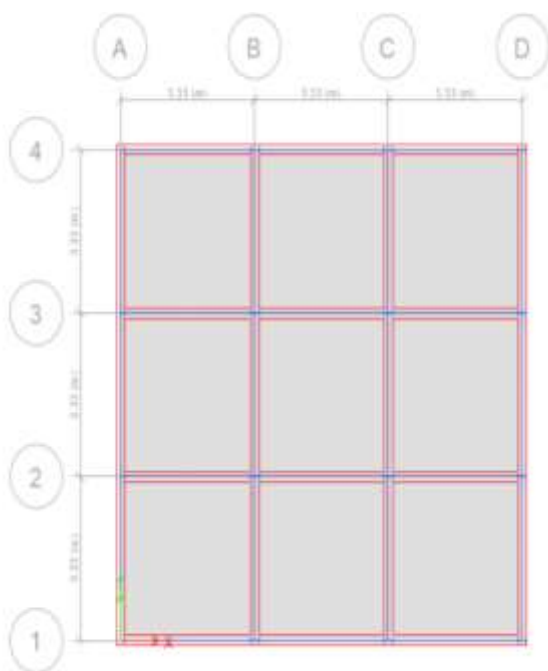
Plan View of Filled Elevated Compositd Water tank
